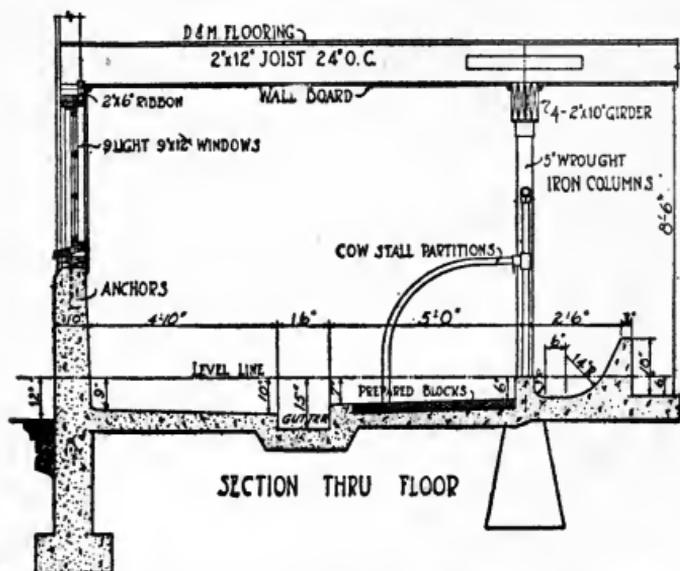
Cross Section Showing the Manner of Constructing the Concrete Floor and Wall and Stable Window
